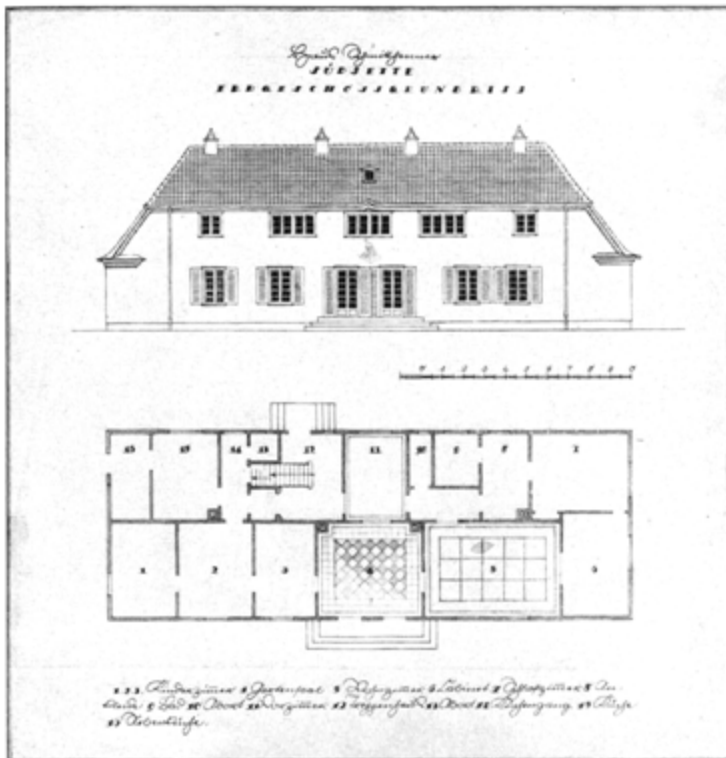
Floor plan and elevation of Schmitthenner House [Die Kunst 28 (1927) 5]
